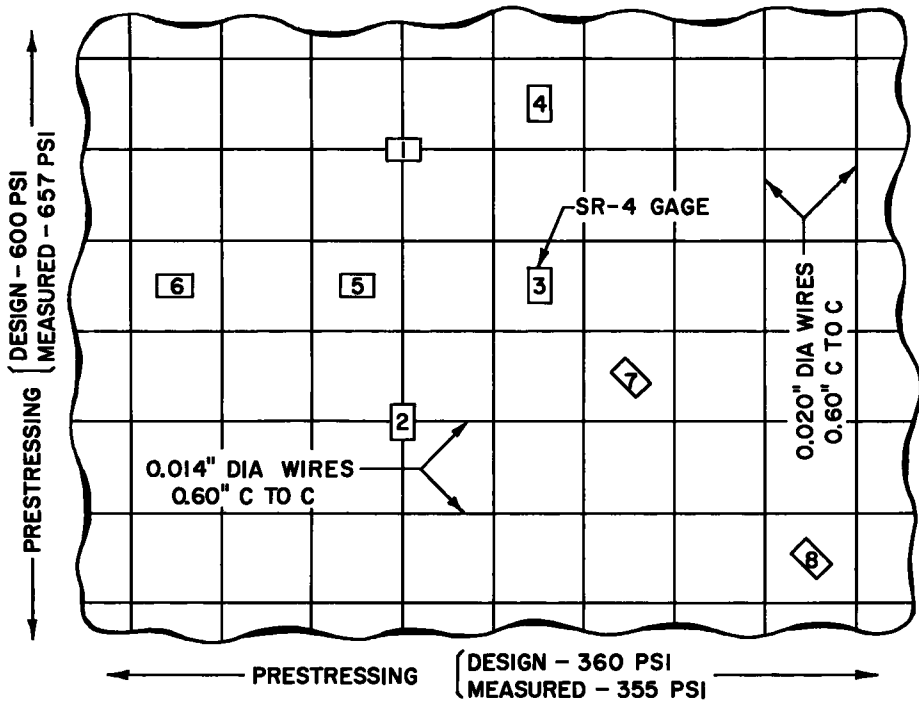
Arrangement of SR-4 strain gages for measuring effective prestress - Slab No. 12.
